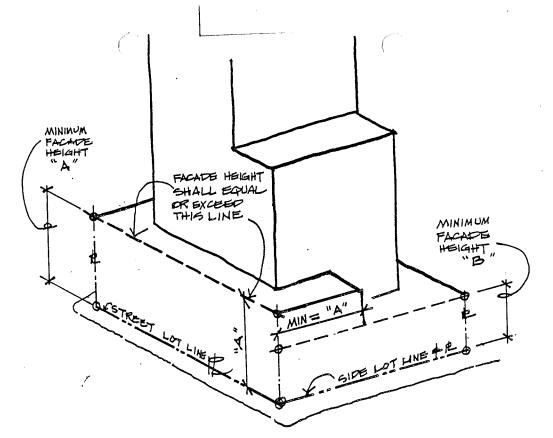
B MINIMUM FACADE HEIGHT AT CORNERS
